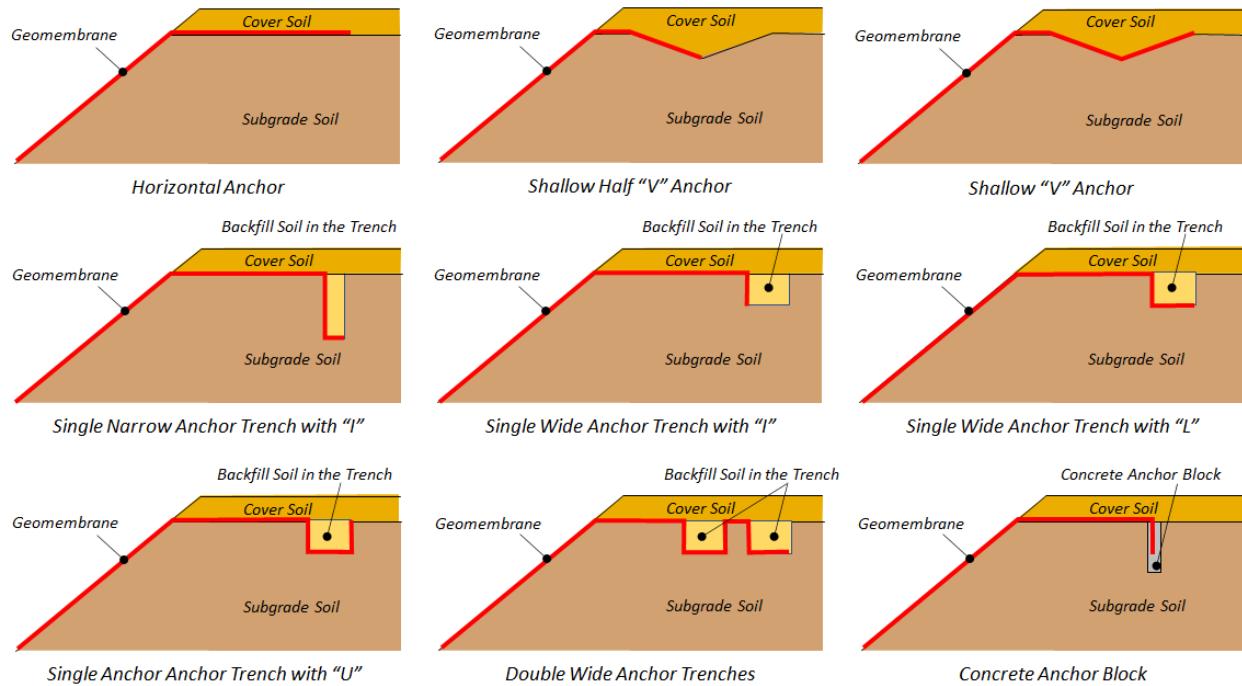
Types of Geomembrane Anchorage Designs (Lajevardi, Briancon, and Dias, 2014).
